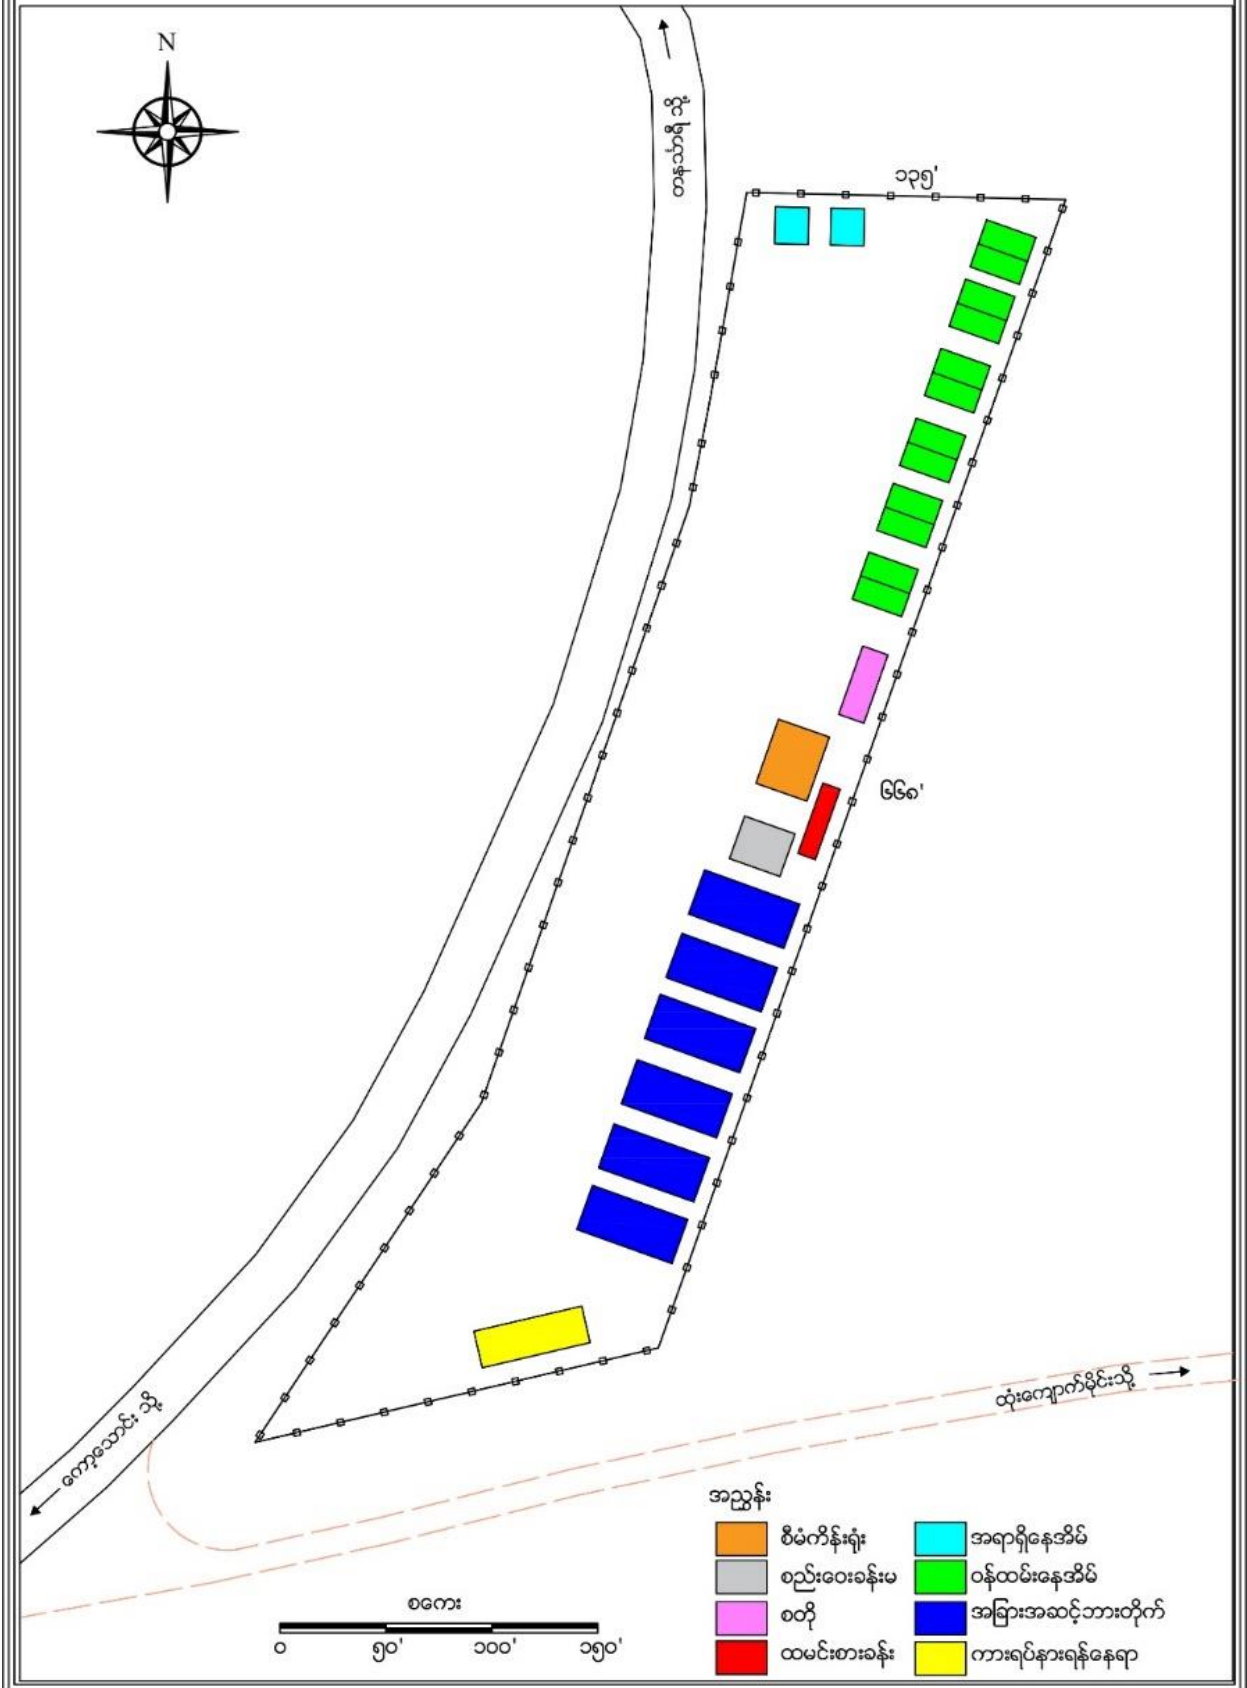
10 – Site Layout Plan for accommodation for Project staffs and workers
